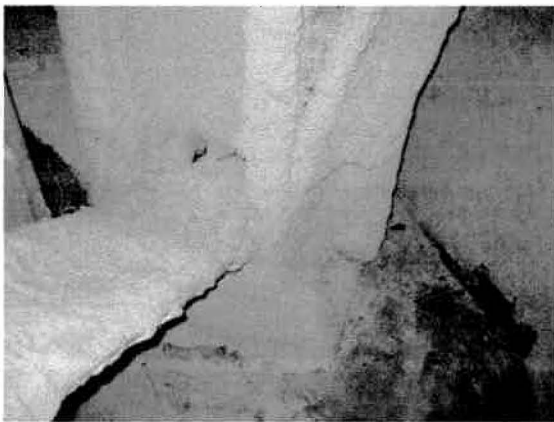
Staining at base of steel structure (reduced compared to floors above)
